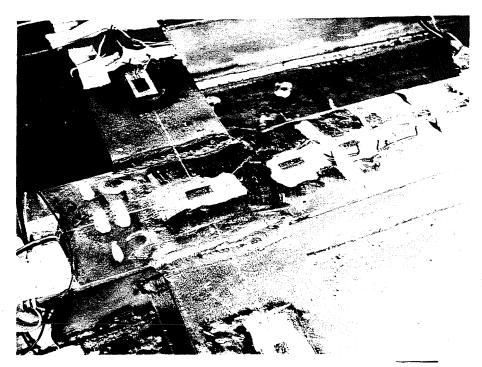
FAILURE OF WELD BETWEEN LONGITUDINAL AND TRANSVERSE BEAMS IN SPECIMEN V-F,~130-KIP LOAD
